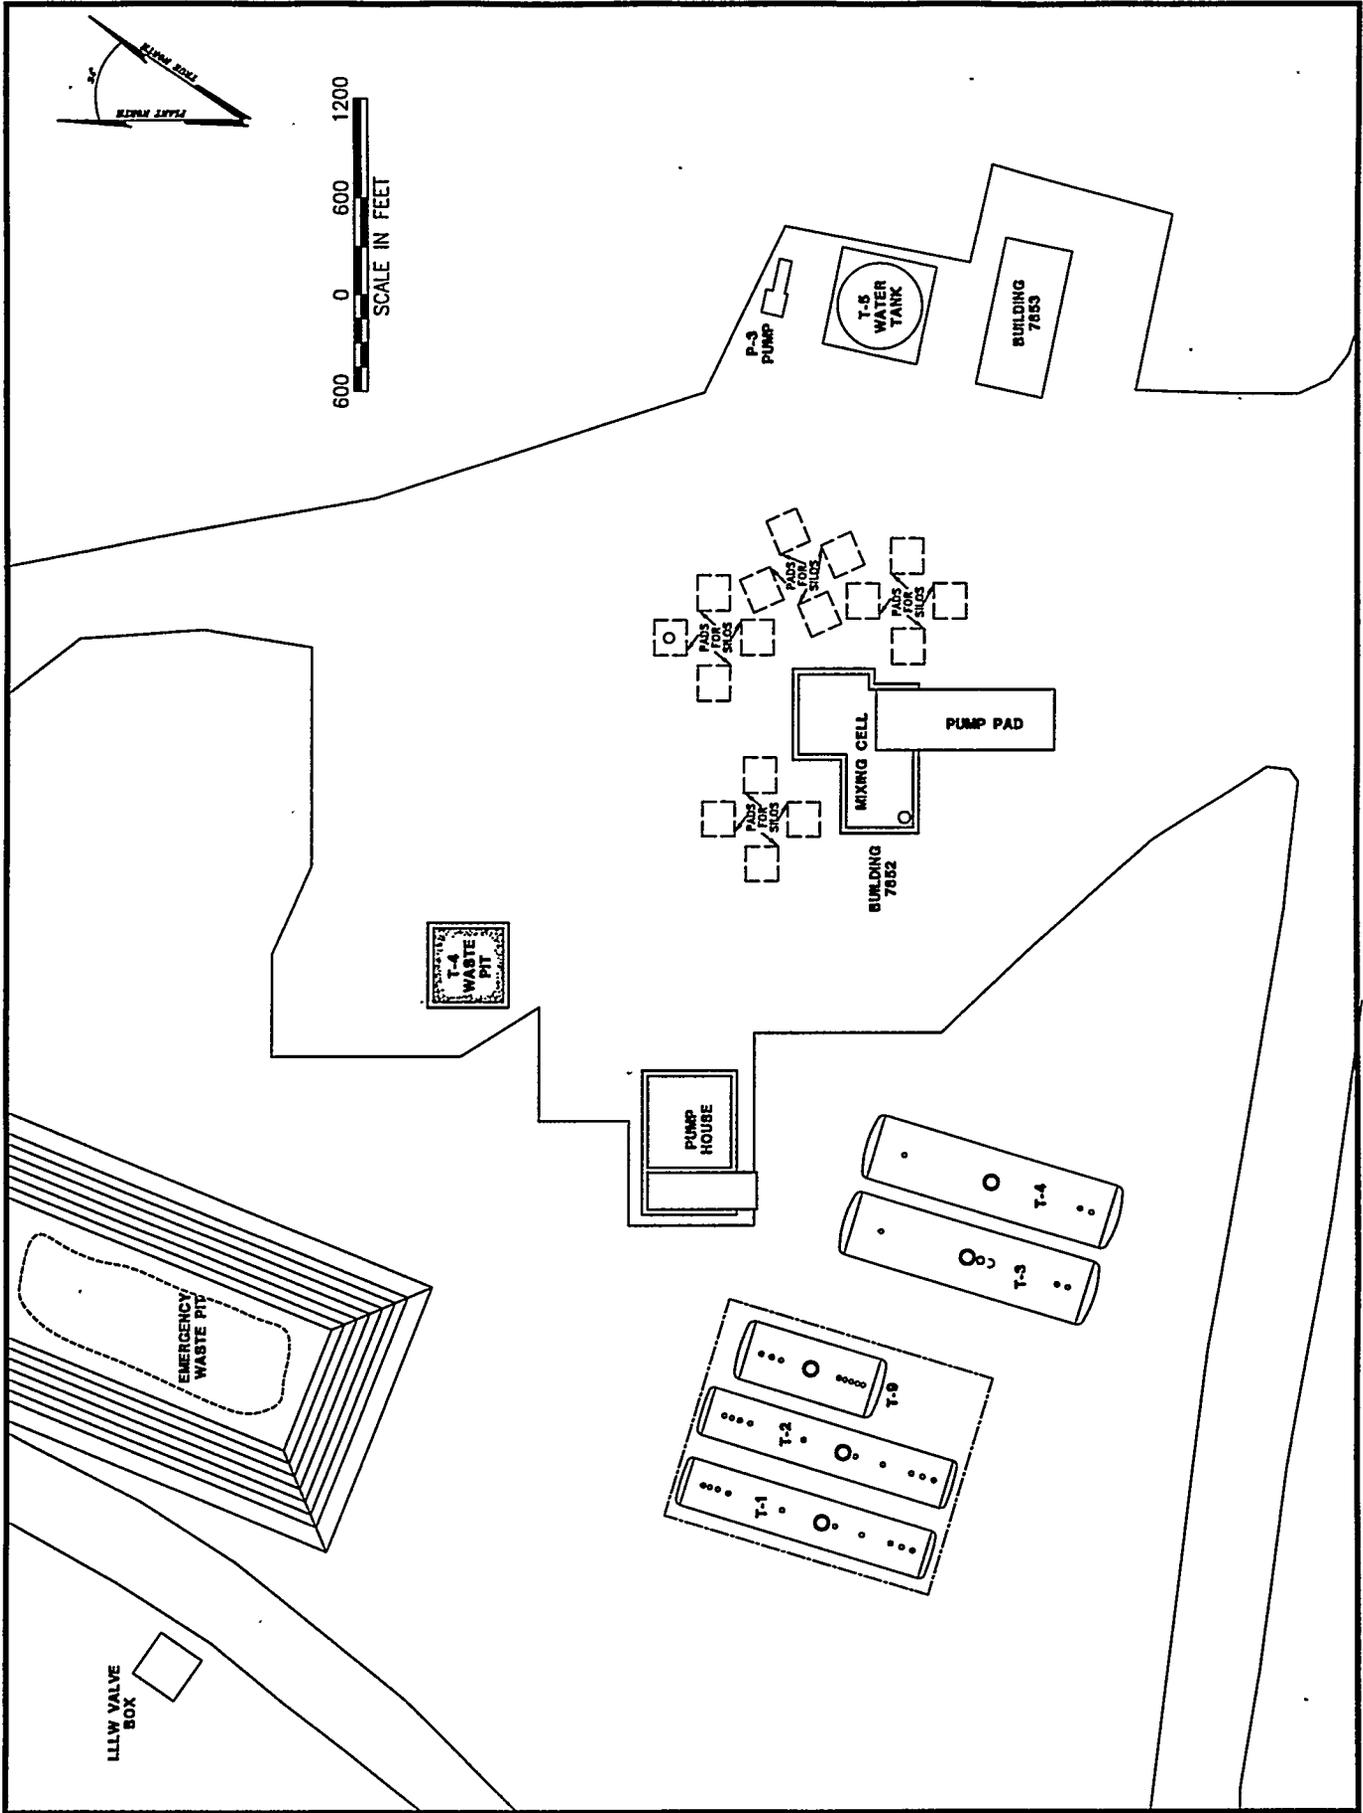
Old Hydrofracture Facility Site Layout Map
